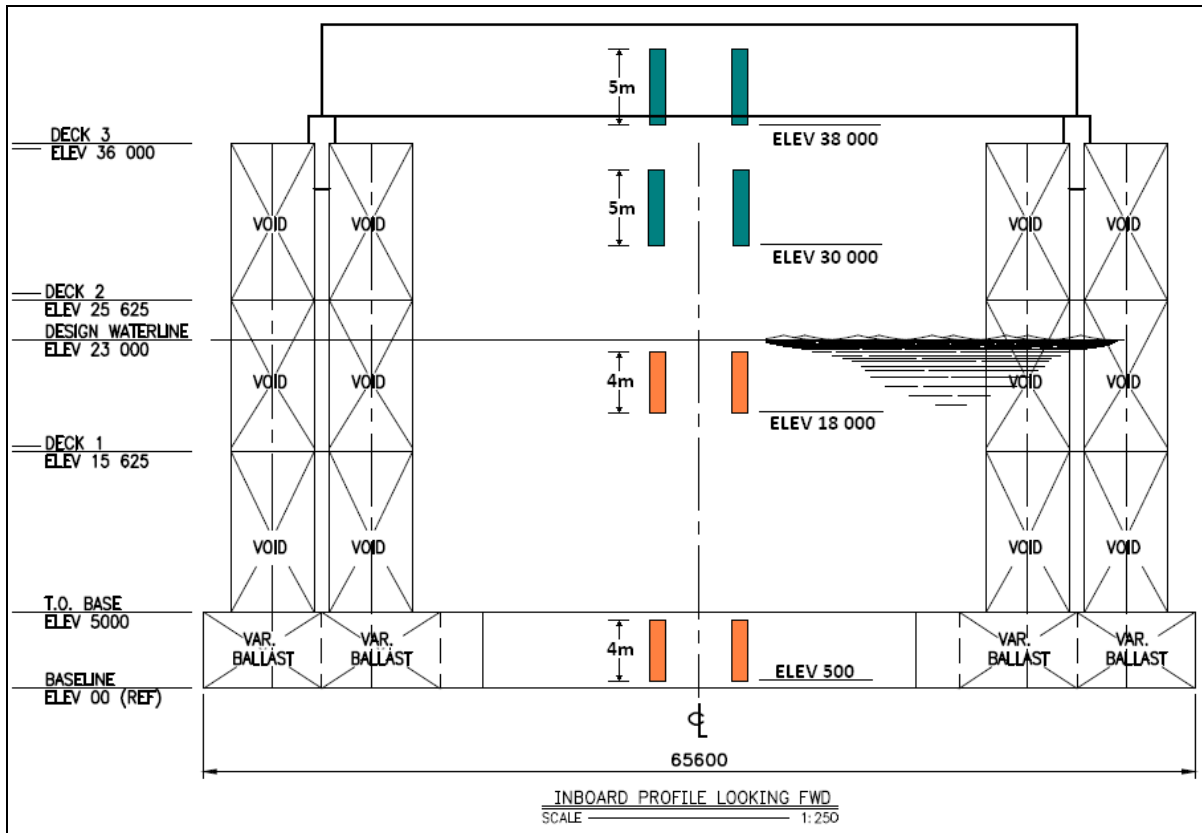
Gripper and Guide Dimensions – Pilot Plant (4 m Pipe) [xiv]
